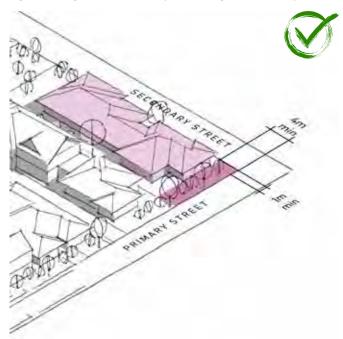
Single House and Grouped Dwellings - Street Setback Example Diagram
